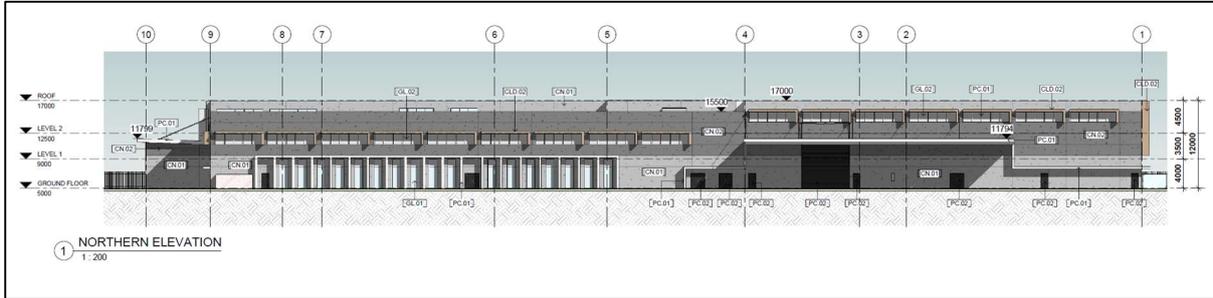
Northern Elevation. Source: EJE Architecture (May 2024)
